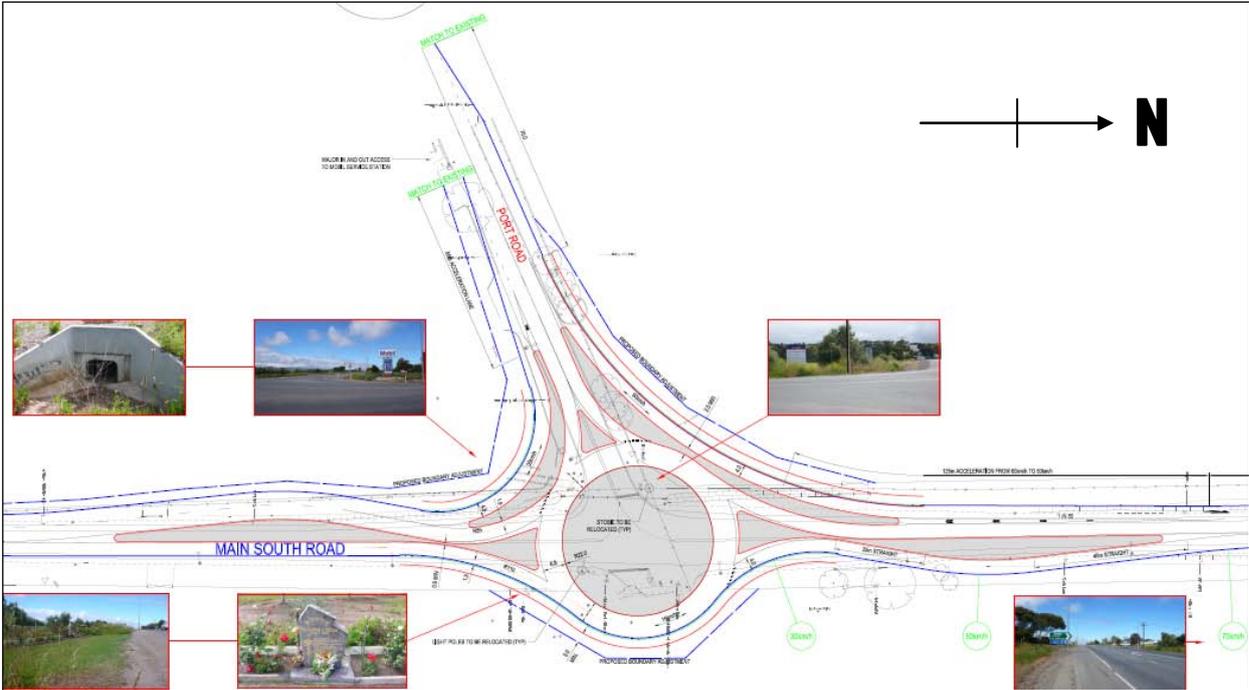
Proposed Upgrades for Port Road Intersection: Option 2 - Roundabout
